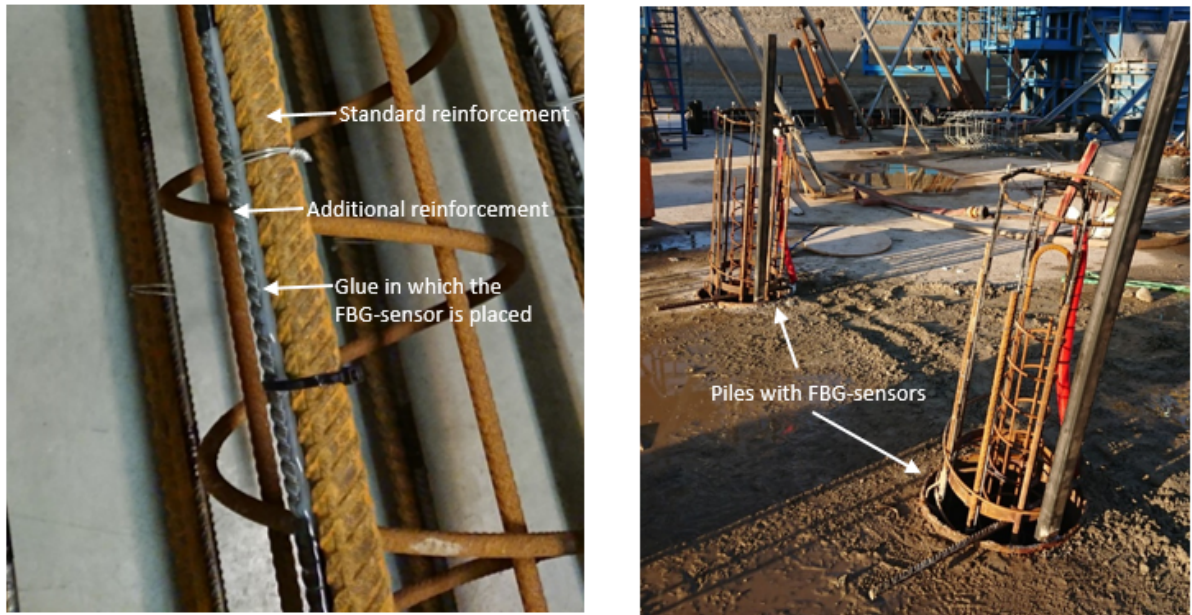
FBG sensors placed in reinforcement steel of bearing piles
